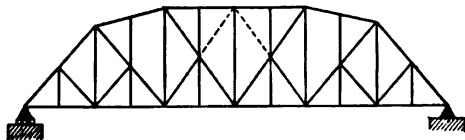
Sub-divided Pratt Truss with Inclined Top Chord commonly known as the Pettit Truss.
